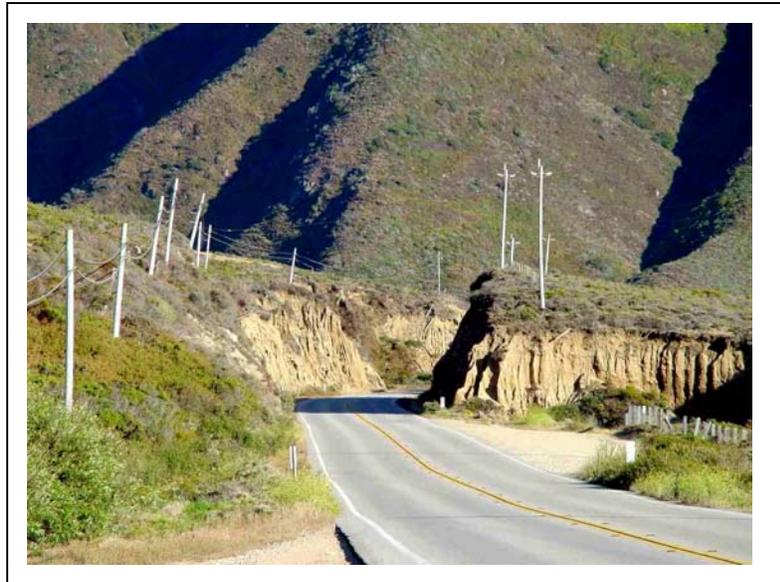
A road cut along Highway 1 on the Garrapata Coast. Steep cut slopes, typical of early highway construction, can be stable even with visible rills from erosion. Constructing flatter slopes (or “laying back” the slope) would alter the visual context and require a larger area of disturbance. (See also Section 3.6 regarding the prominence of overhead utility lines evident in this view.)
